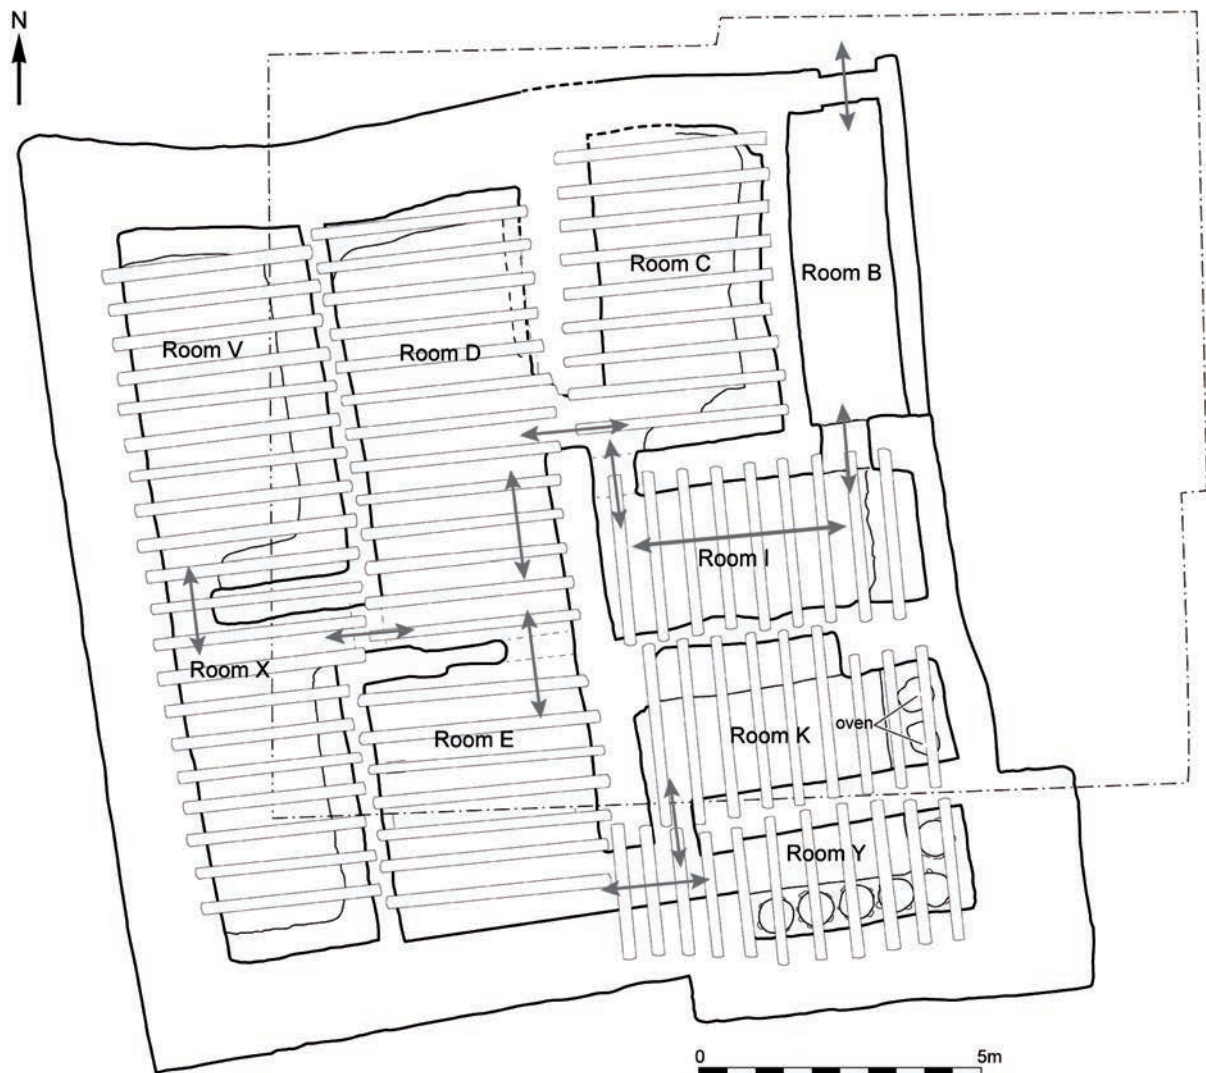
Hypothetical reconstruction of the house at this phase showing directions of access from room to room and the proposed arrangement of roofing poles (drawn by the author, digitised by Kate Morton)
